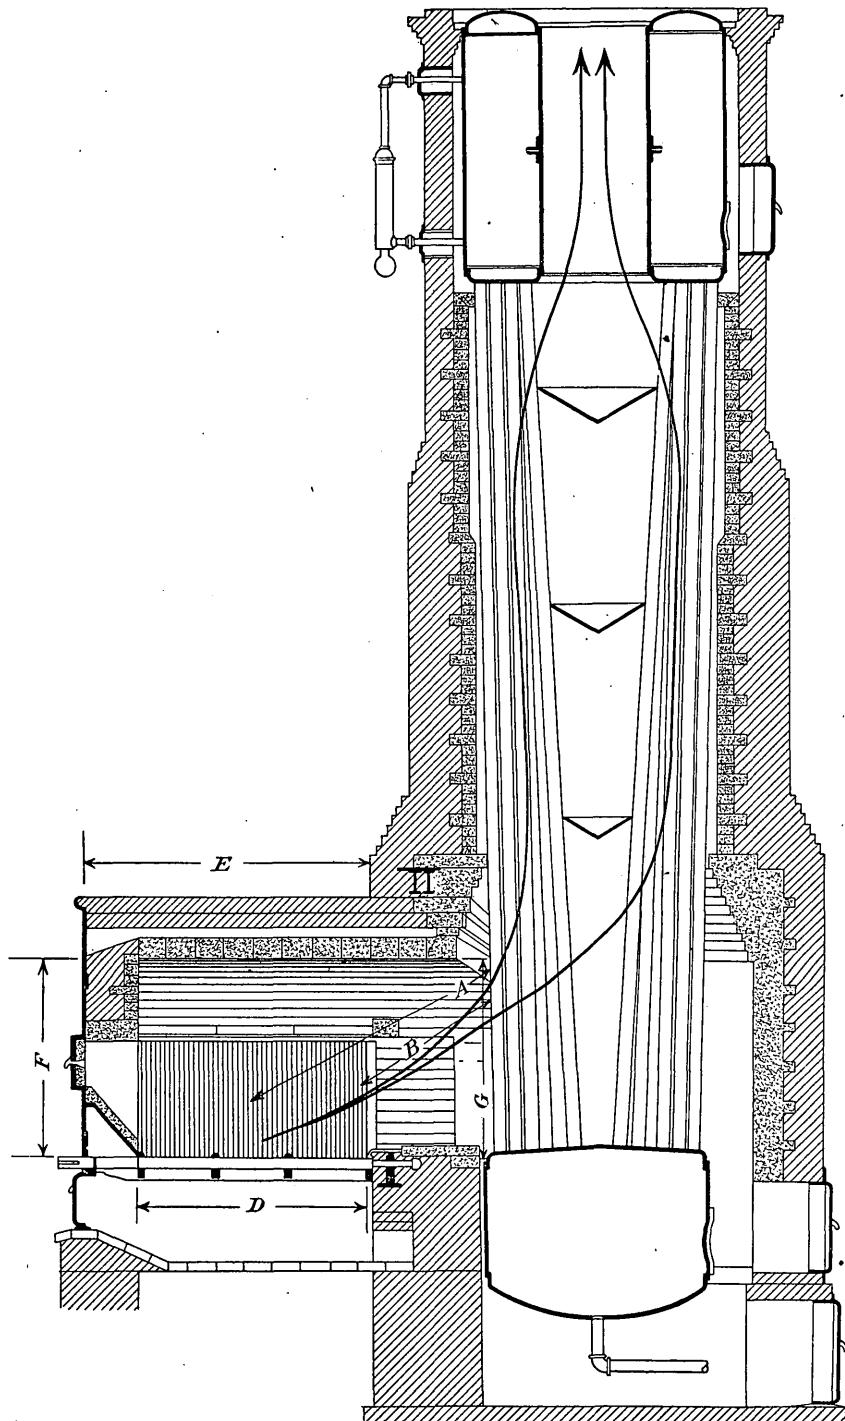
Side-feed stoker in Dutch oven and Cahall boiler.
